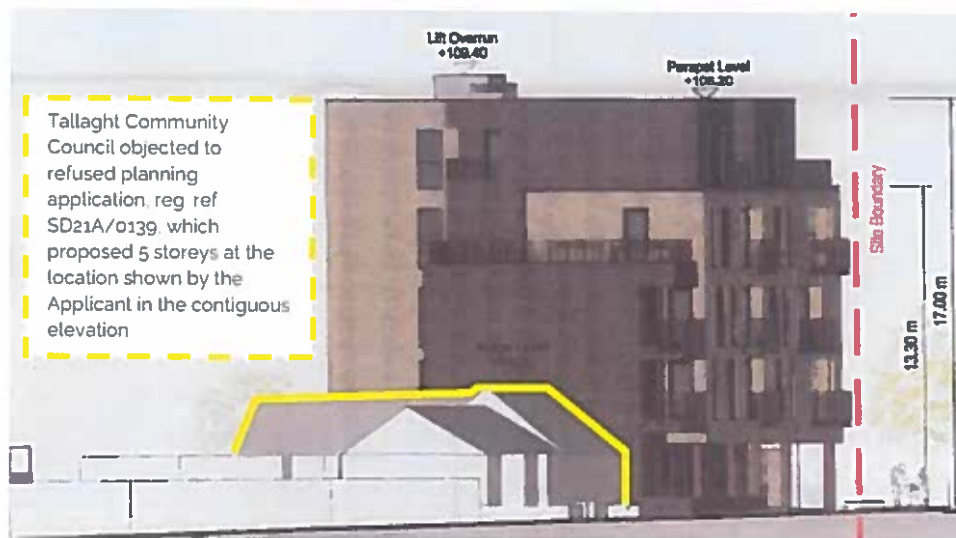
Original scale of proposed Block B under refused planning application, reg. ref. SD21A/0139
